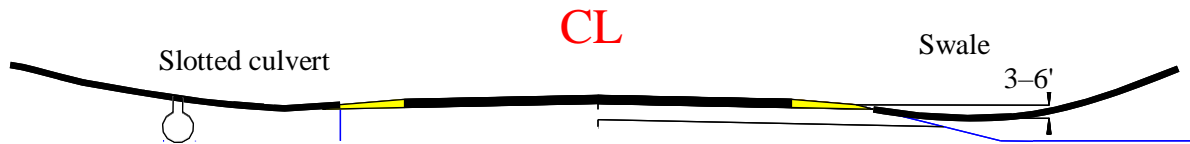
Use of swale or intercepting drain to provide positive drainage
